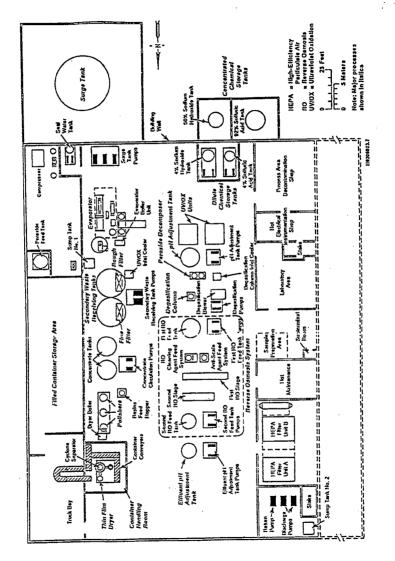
200 Area Effluent Treatment Facility Floor Plan.
